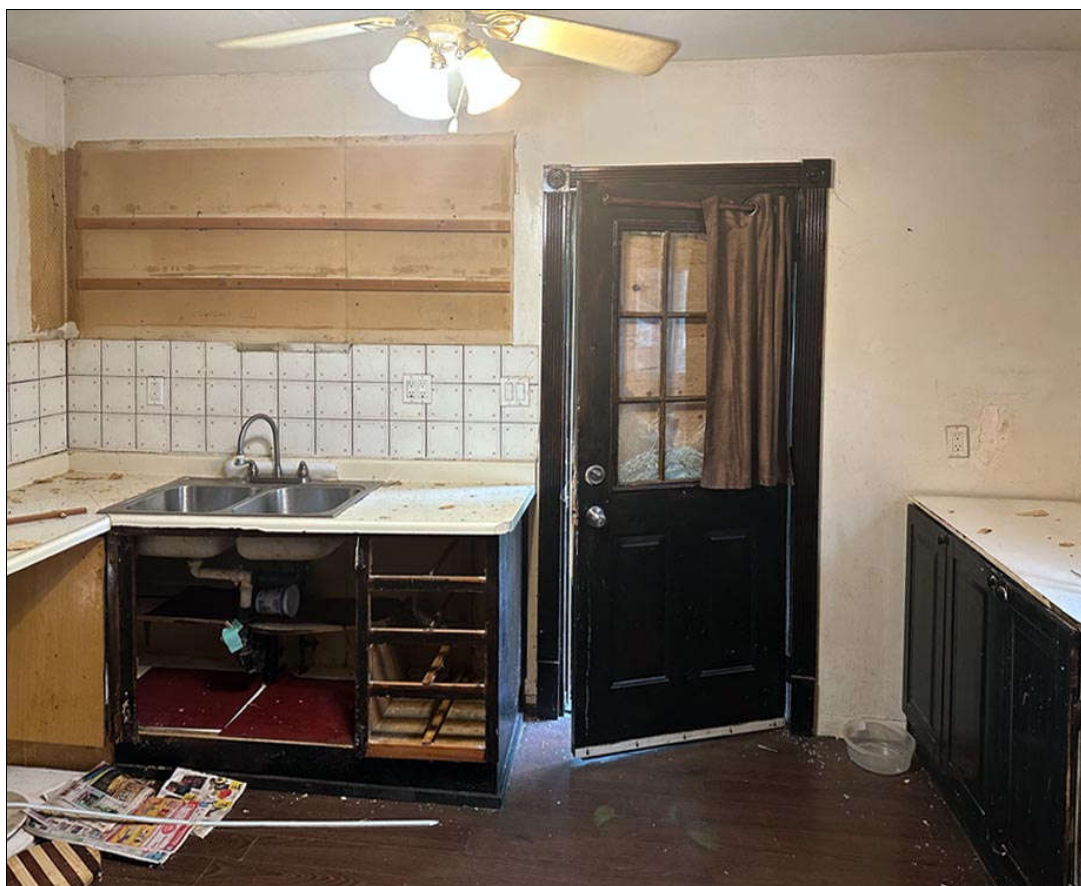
kitchen - original door trim, plaster replaced with drywall, tongue & groove floor
